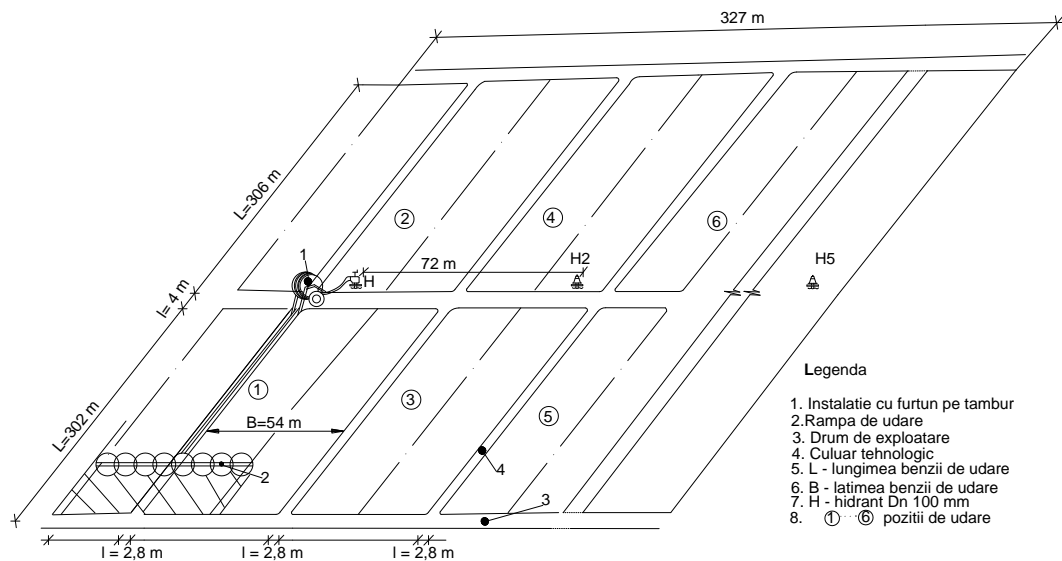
Scheme watering the plant sprinkler irrigation hose drum
